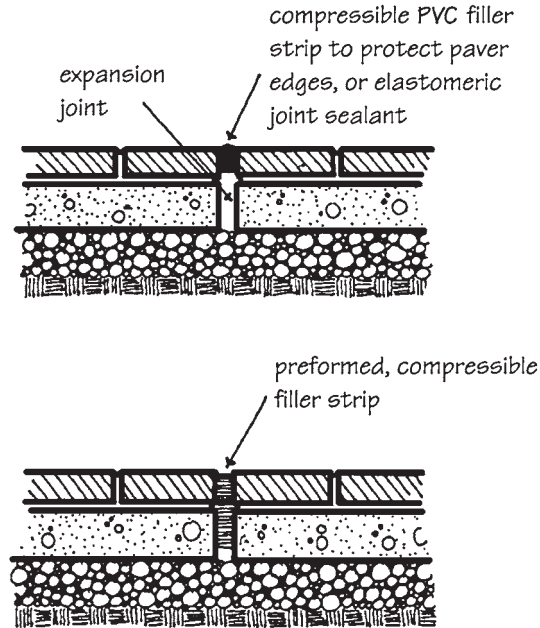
Expansion joints for rigid brick paving. (From BIA Technical Note 14A.)
